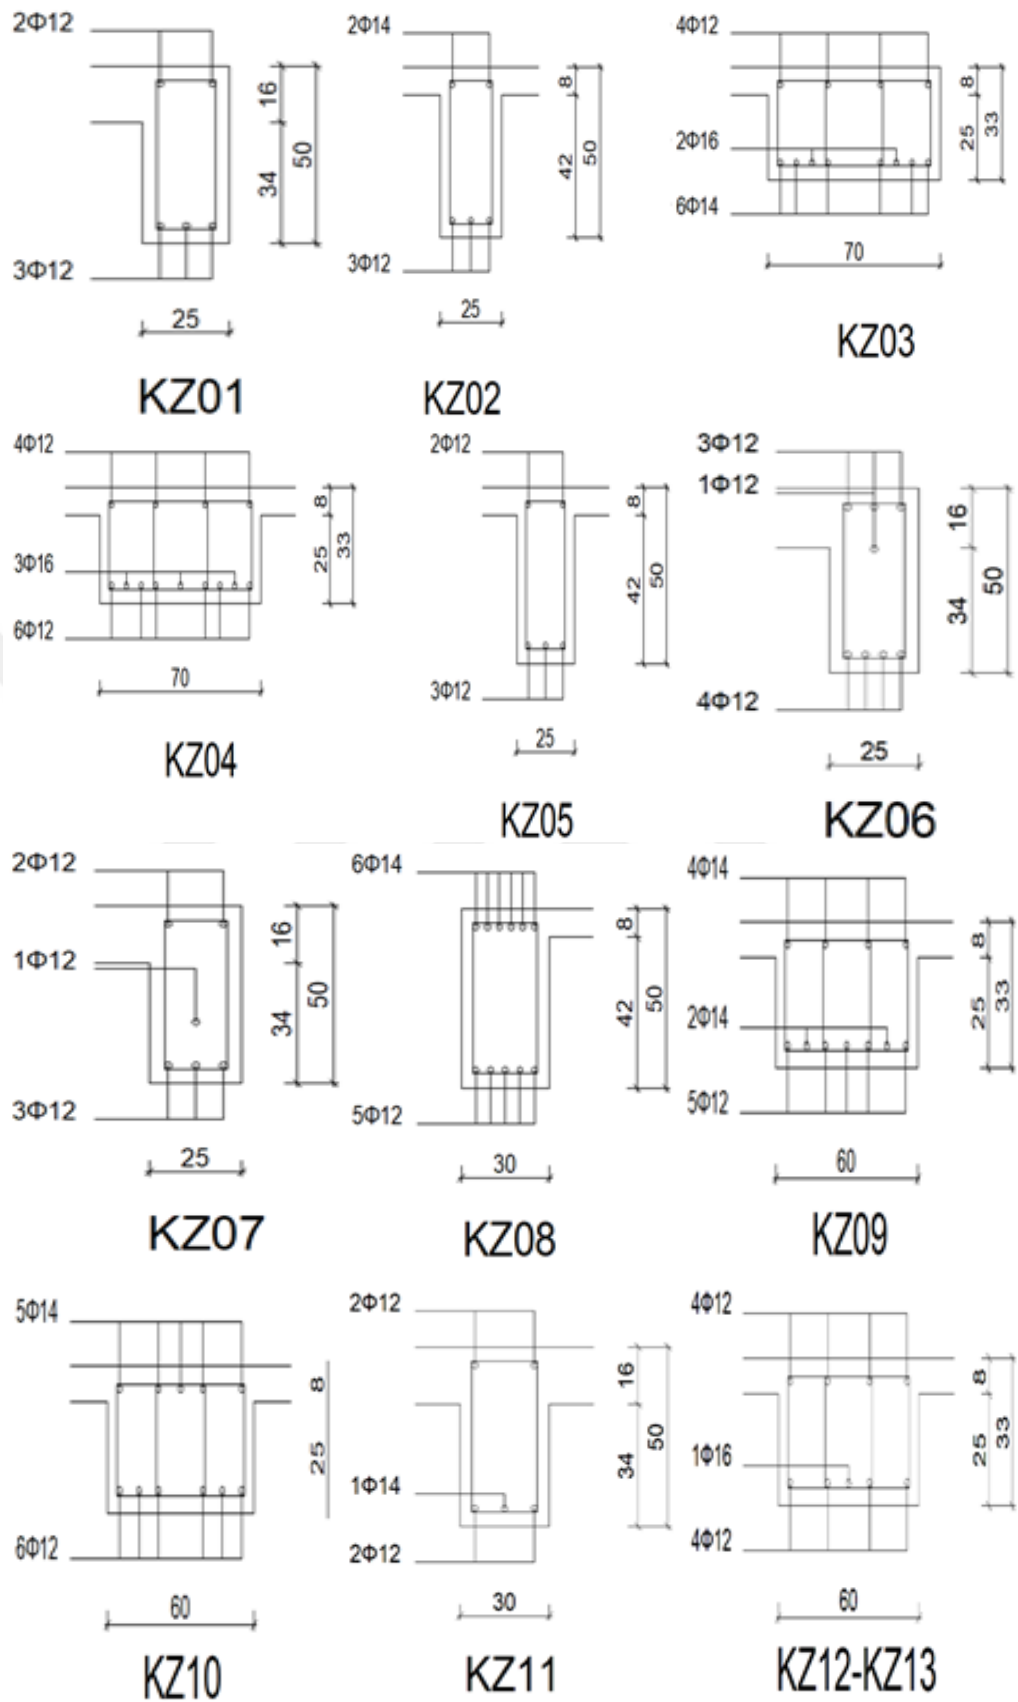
Reinforcement details of beam sections (KZ01-KZ13).
